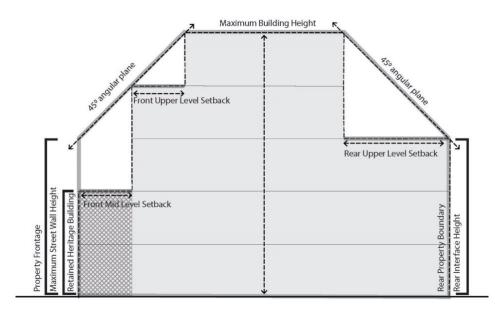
Building envelope requirement – Heritage Building (Figure 1 in Schedule 15 to Clause 43.02 Design and Development Overlay).
